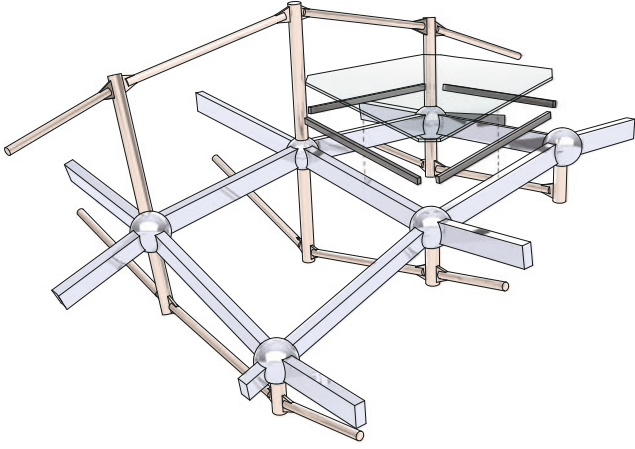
Schematic closeup view of our structural system: main layer with rectangular cross sections and ball joints; additional layer with struts and solid circular 'chords' beams. The main layer's infills are equipped with panels.
